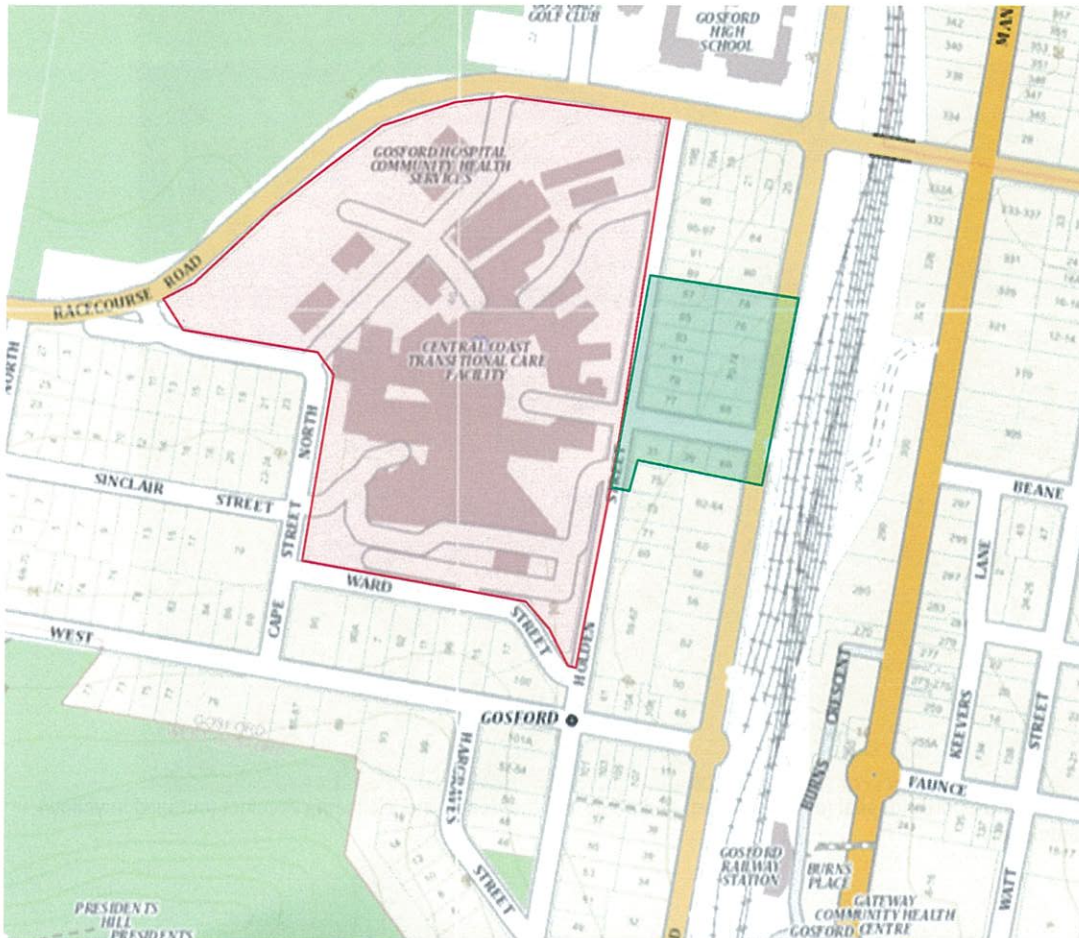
Site Plan, existing Gosford Hospital outlined and shaded in red, proposed Stage 1 of the Health and Wellbeing Precinct in green
